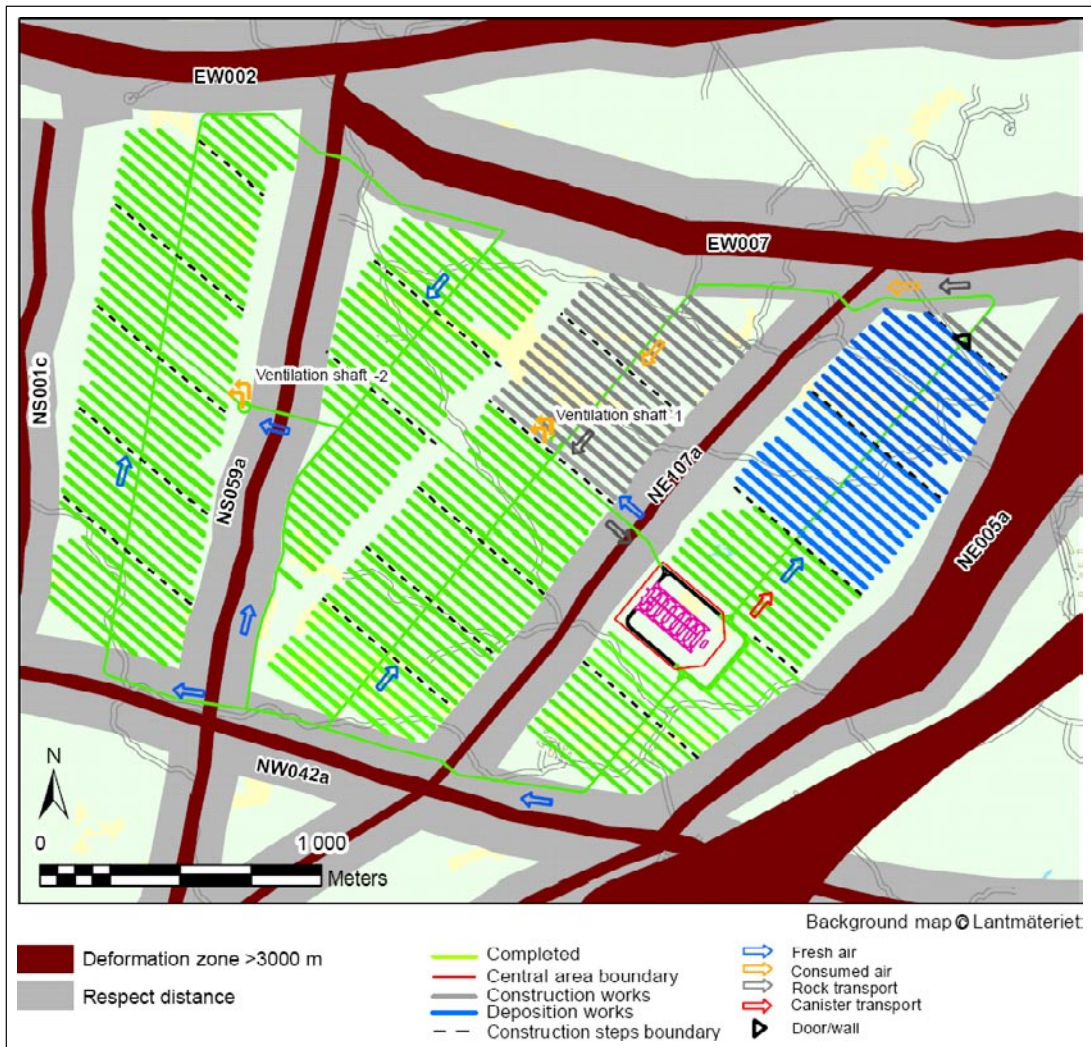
Excavation in construction steps 18 and 19 and deposition works in construction steps 16 and 17.
